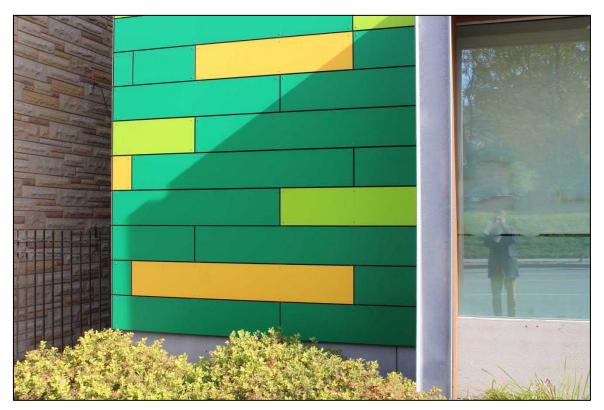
Detail of green and yellow cladding added in 2015. (AECOM, 2018)
